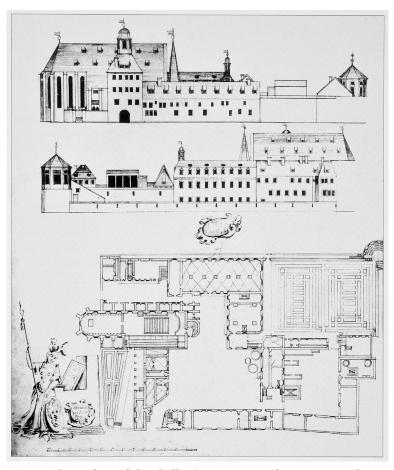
Floor plan of the Collegium Jenense drawn around 1770 by architect Johann Wilhelm Haase.
